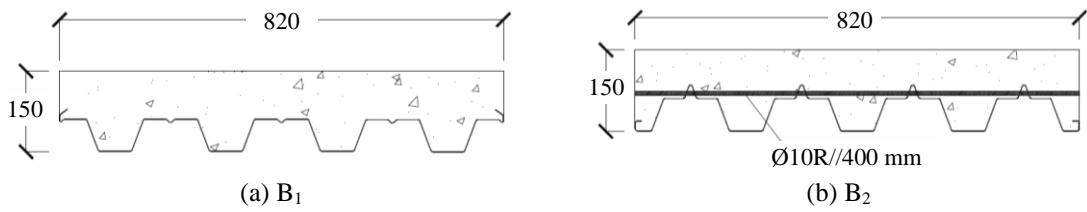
Cross-section of the specimens – Group B (dimensions in mm)
